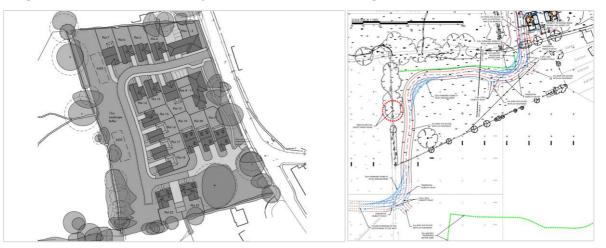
Existing Access (Wychwood Place) / Proposed Northern Site Access
